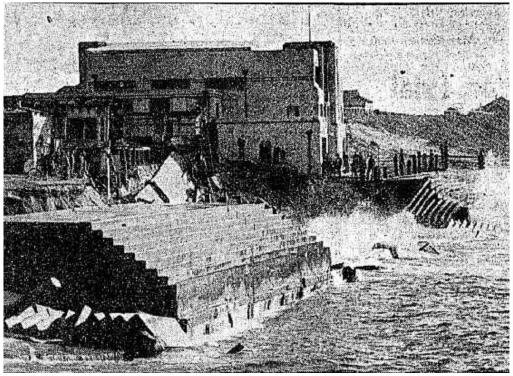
Collapsed seawall, kiosk and surf pavilion at North Cronulla. (Source: 'Council will Abandon Clubhouse to the Sea', The Sun, 27 August 1946, p.3.)
